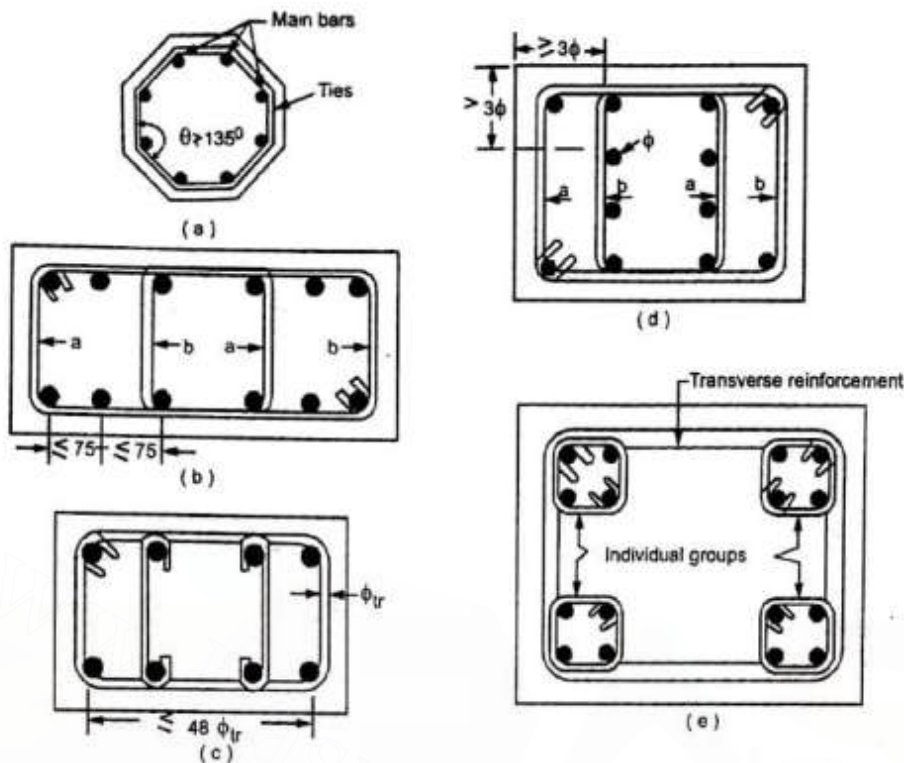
Arrangement of Transverse Reinforcement
